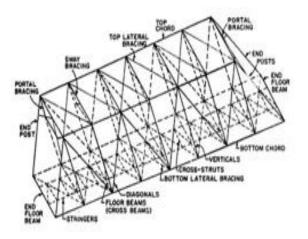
Diagrammatic View of a Through Type Truss Girder Bridge.
